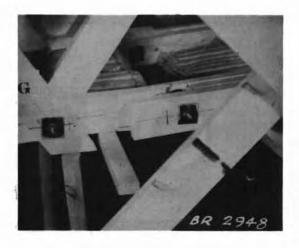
Failure at joint in lower chord of W-truss No. II under dead load plus ceiling load plus five times live load (snow load)
